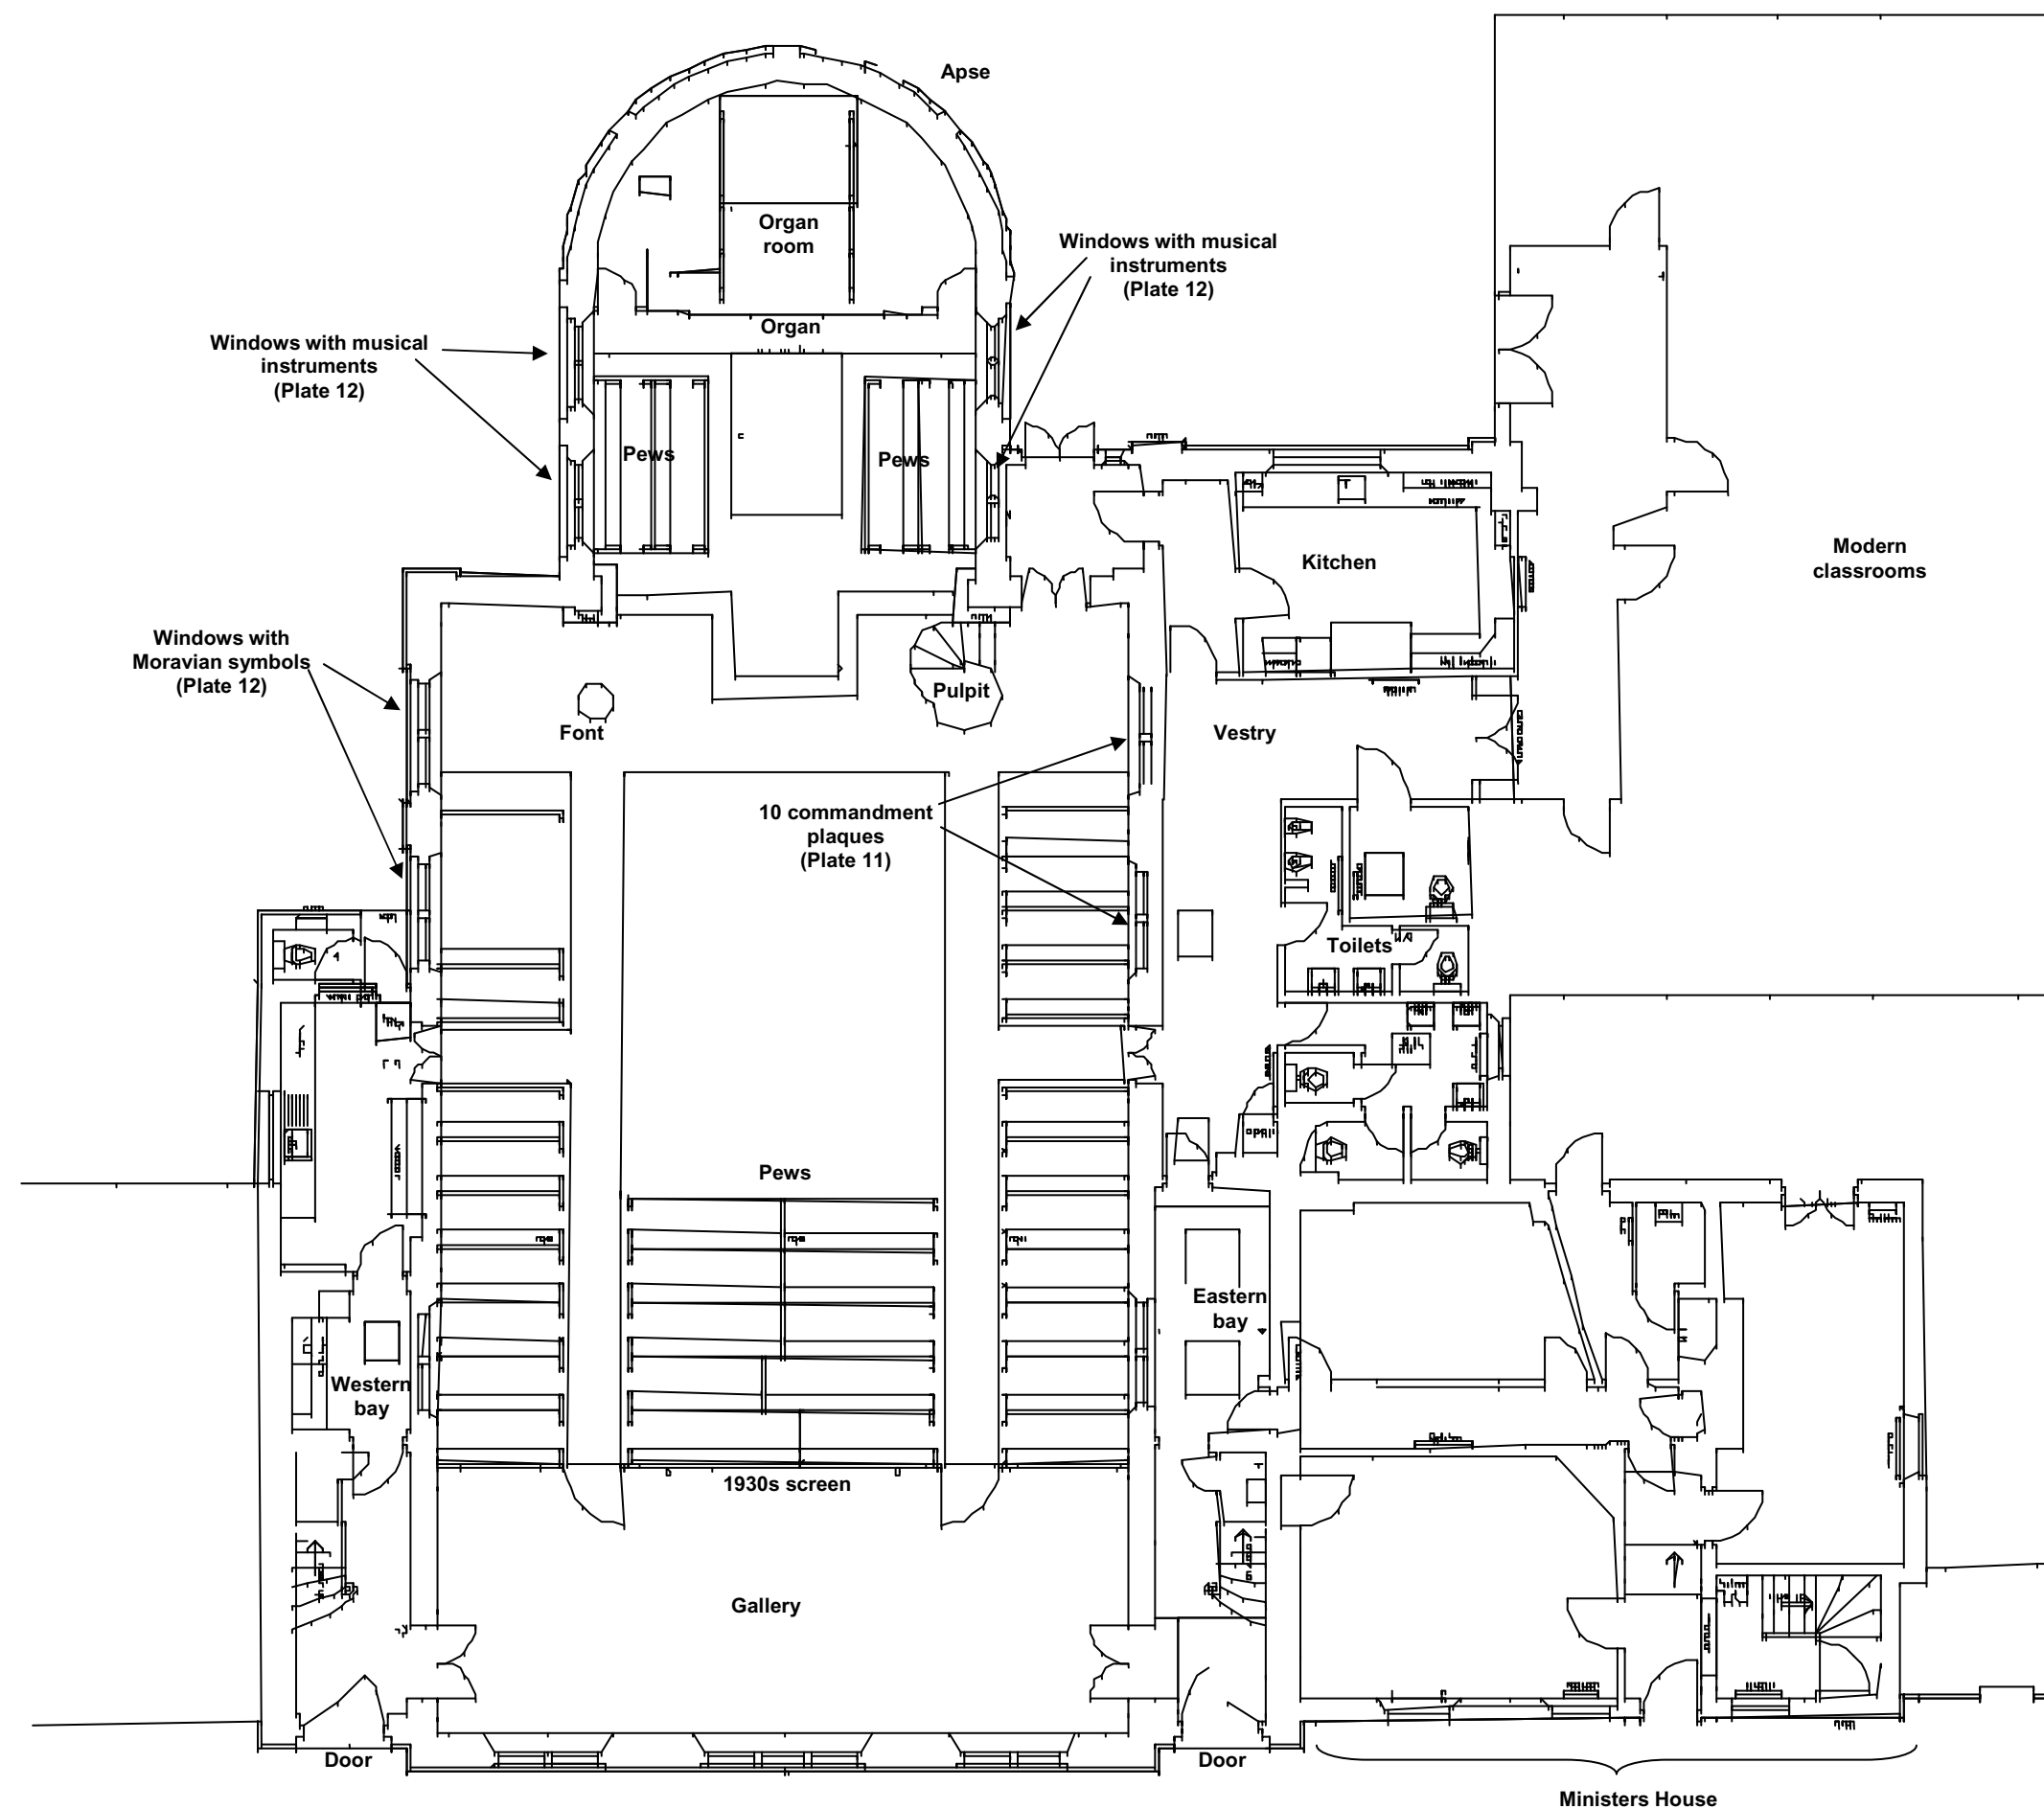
Annotated ground plan of chapel and adjacent buildings (not to scale)
